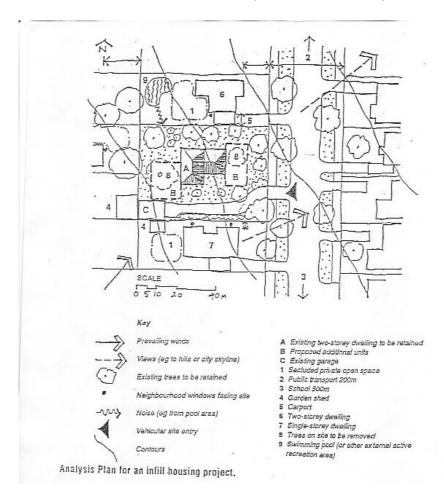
SITE PLAN (Source AS 1100.301 Supp.1 -1986)
